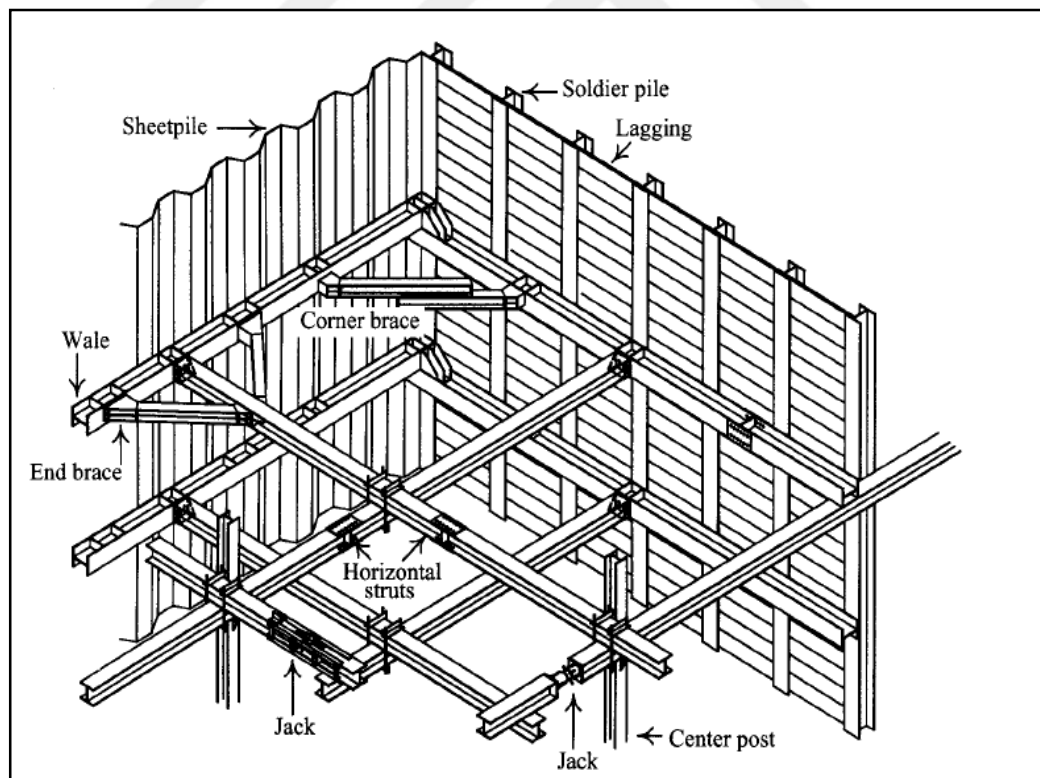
Components of a strutting retaining system (Ou, 2006)
